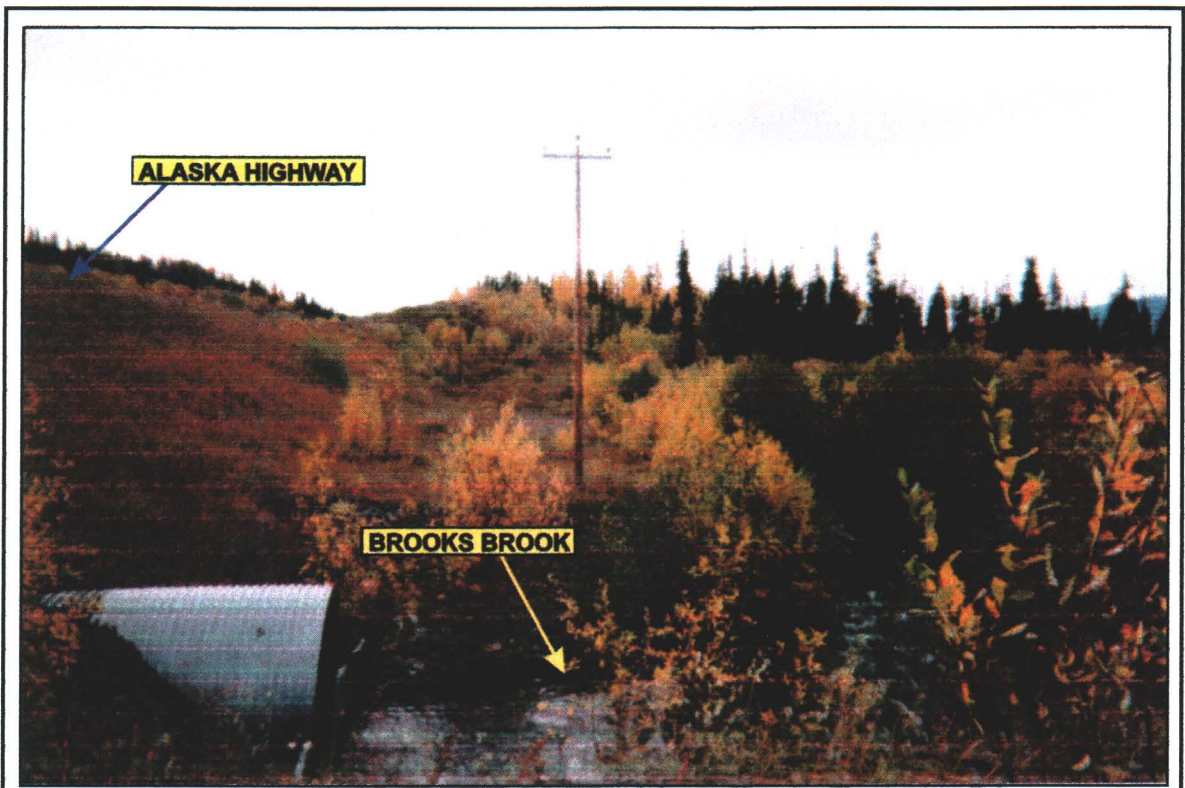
View of Brooks Brook flowing from culvert underneath Alaska Highway.
